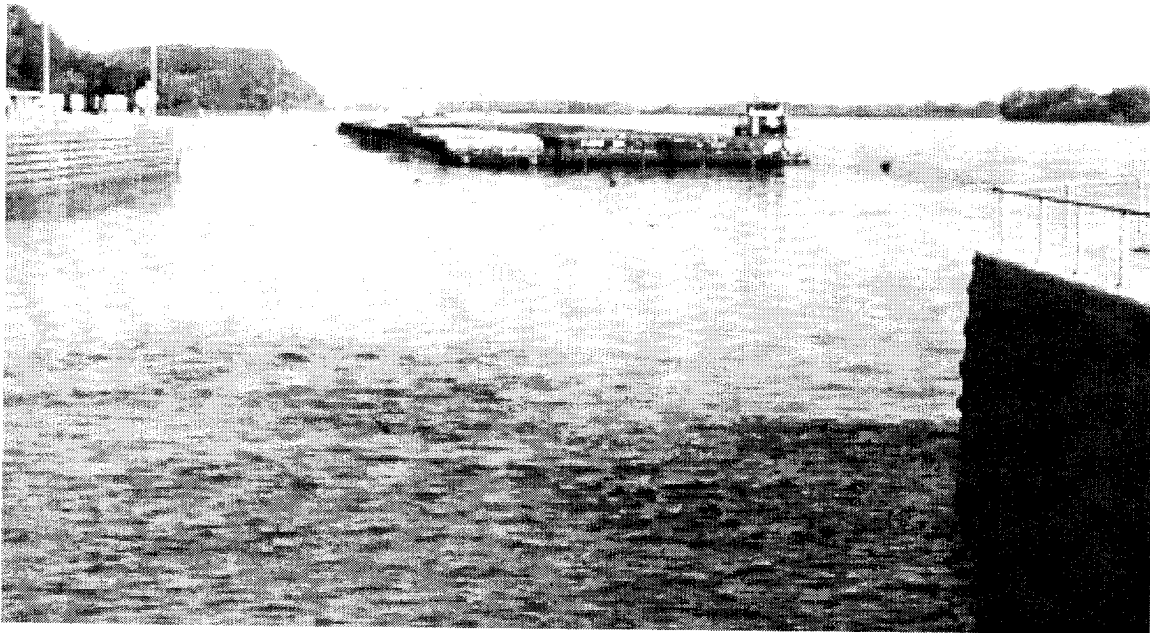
Looking upstream, showing helper towboat pushing the head of a downbound tow into the guide wall. Note clearance between stern of tow and rock dike.
